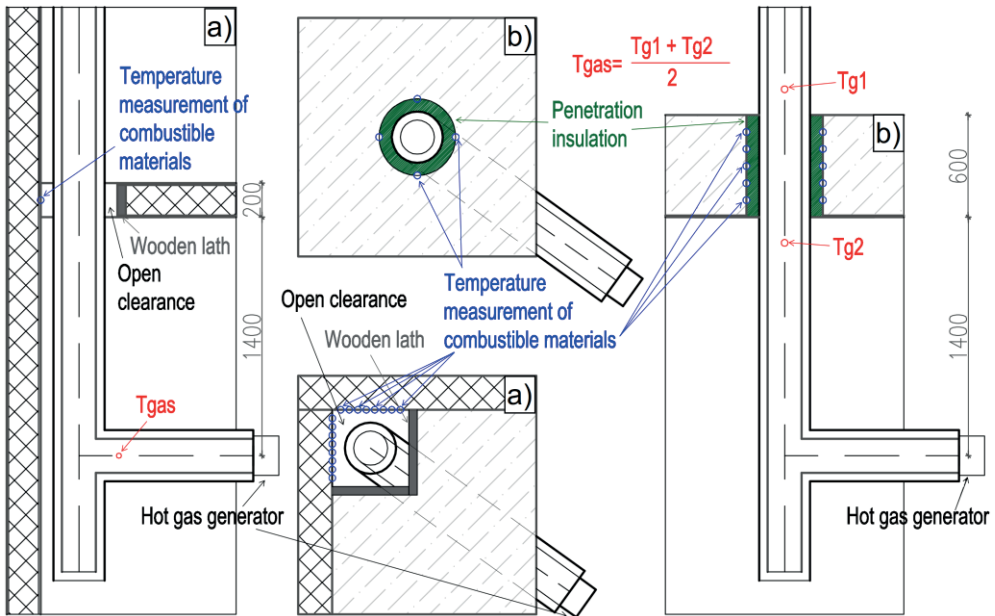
a) Current standard test arrangement of metal chimneys (EN 1859) and b) New proposed test arrangement.
